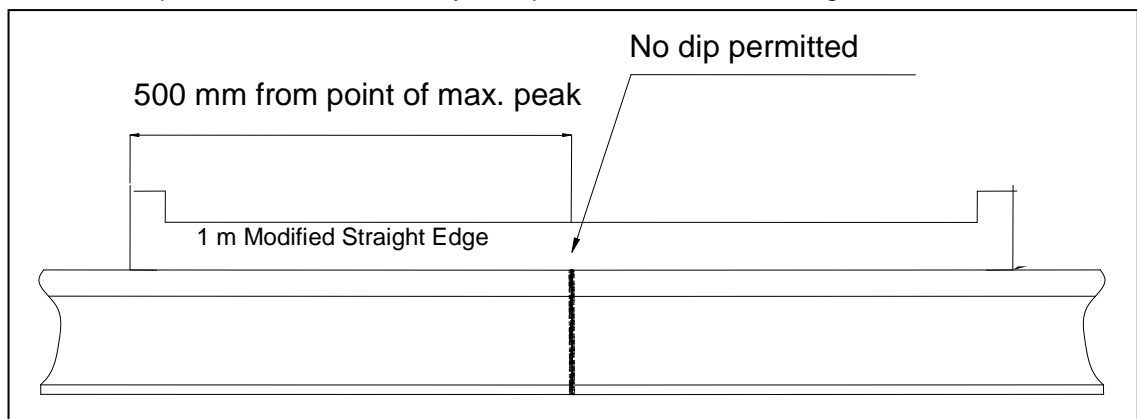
Dipped weld measurement using the ARTC Finishing Straightedge
